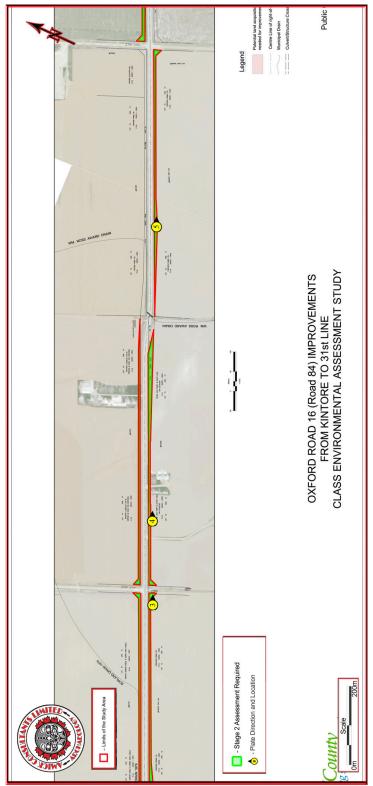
B DETAILED PLAN OF COUNTY ROAD 16
